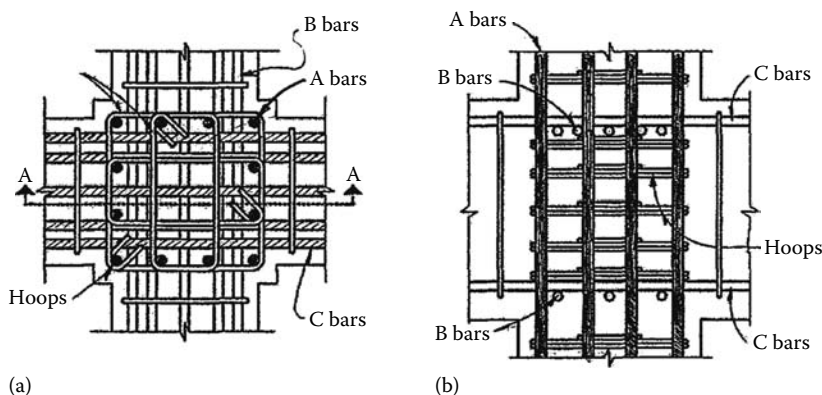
shows a schematic layout of reinforcement in wall pier W1.
